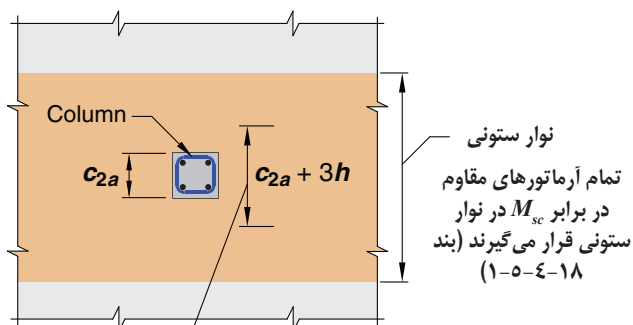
Effective width for reinforcement placement in edge and corner connections.
